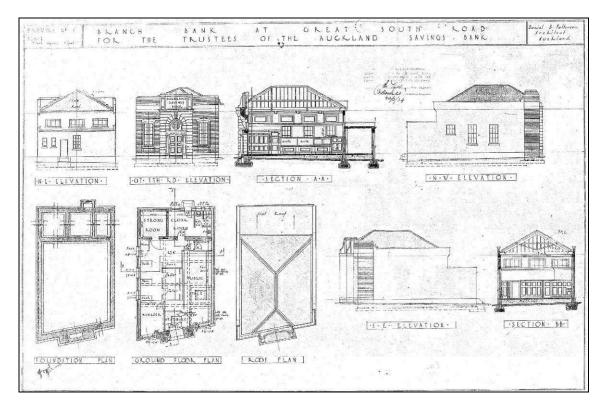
Auckland Savings Bank – Great South Road – 1934 Plans, sections and elevations. Drawing No.1. Auckland Council Filenet. Accessed May 2016.
